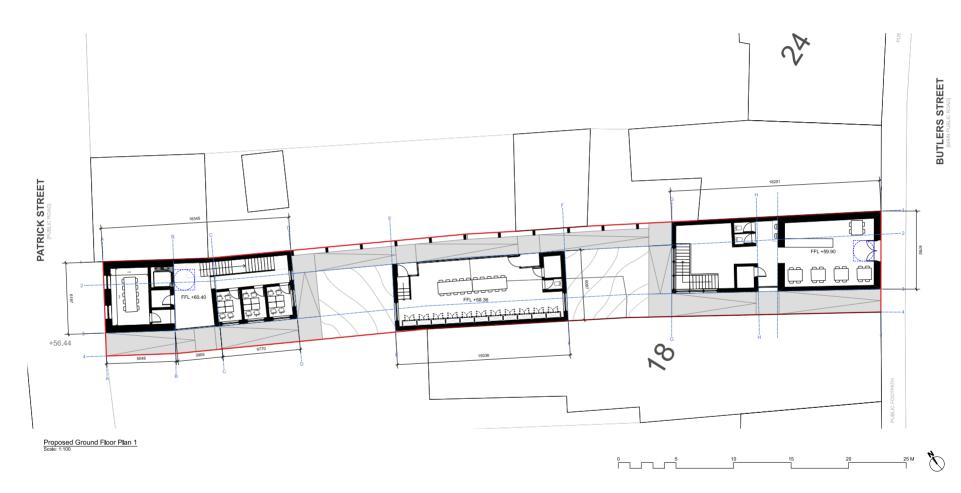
Proposed Ground Floor Layout. Drawing by Cooney Architects
